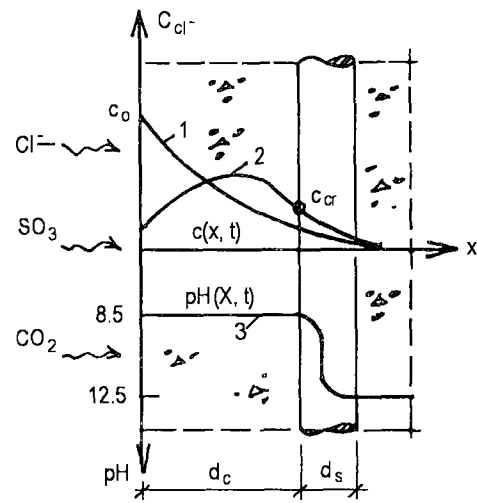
Scheme of chloride penetration (1, 2) and concrete carbonation depth (3) of reinforced concrete
